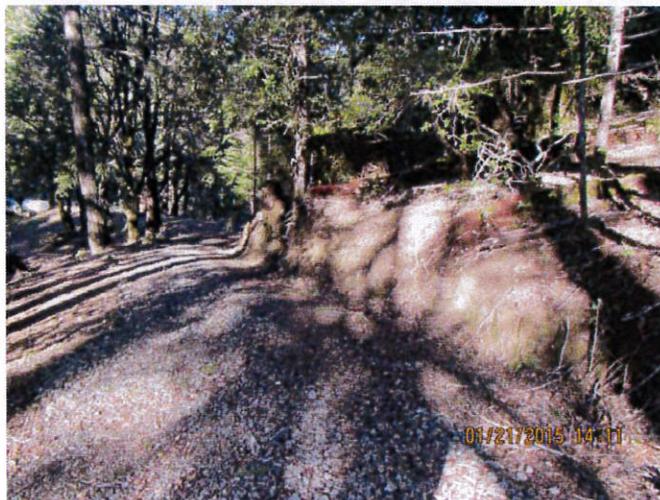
Road from Greenhouse 6 towards Sproul Creek
